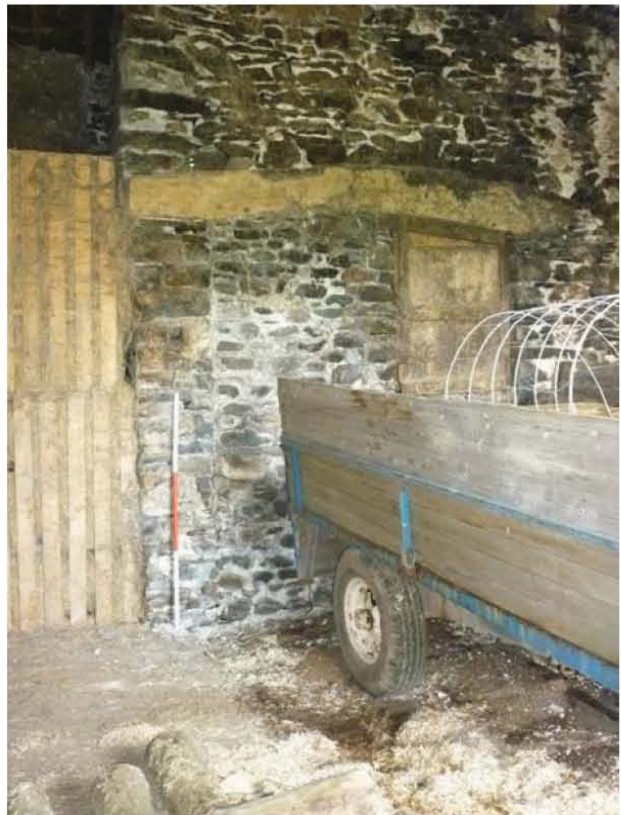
(left): Blocked doorway in the north elevation of upper floor Room 1 of the barns
